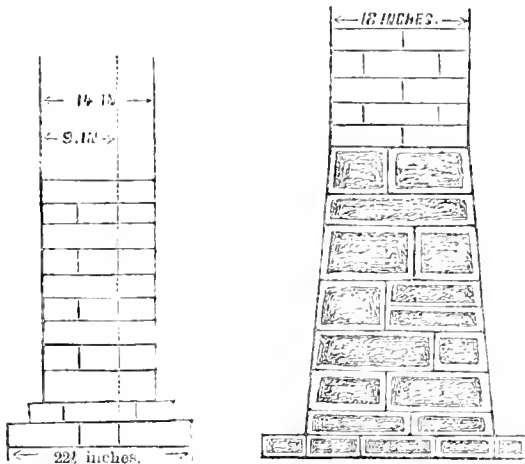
Section of a 9-inch Wall through Pier, the dotted upright line showing the line of 9-inch wall.
